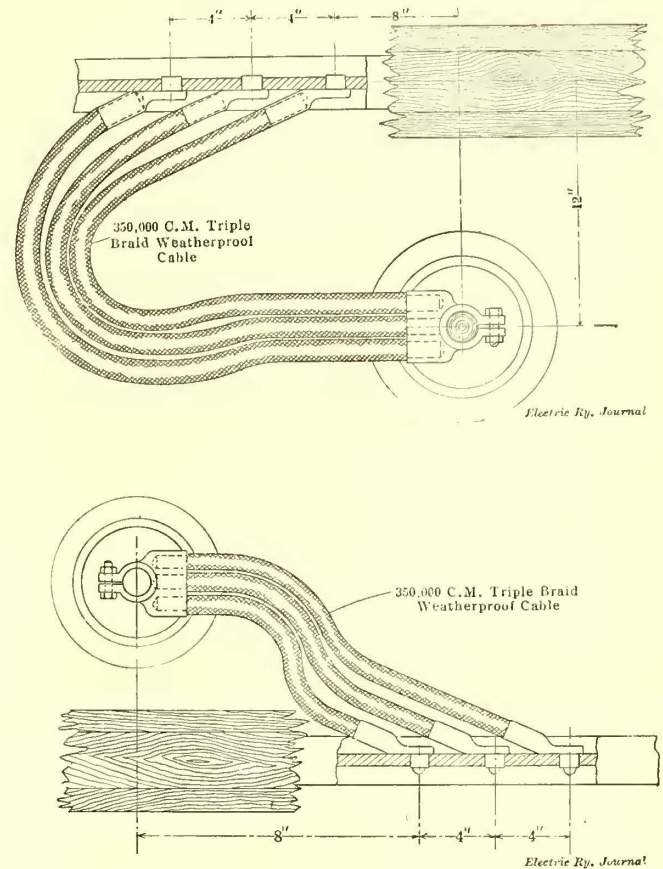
Detroit Tunnel—Terminal Insulation and Other Details of Third-Rail Cables
